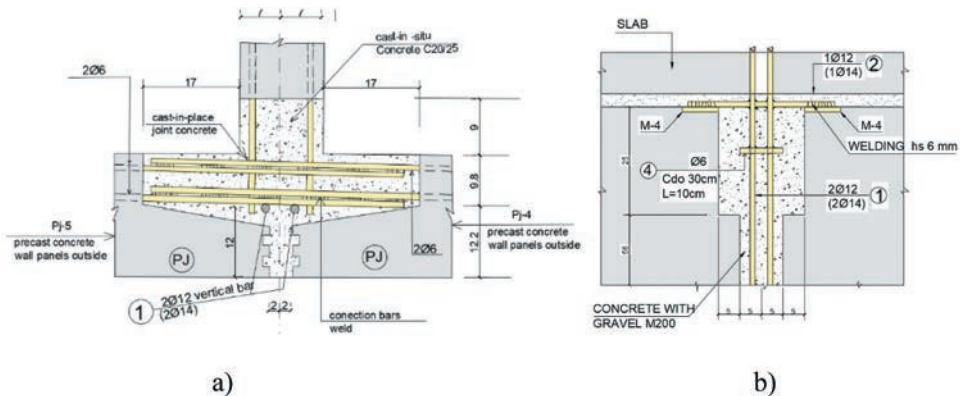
Wall panel connections: a) vertical T-joint VJ2 and b) vertical joint VJ3 between the adjacent exterior wall panels.
